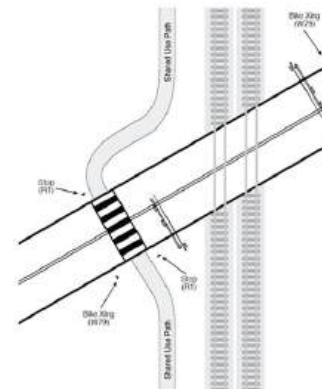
Angled intersection of a rails-trails-road crossing, TRB, 2018
